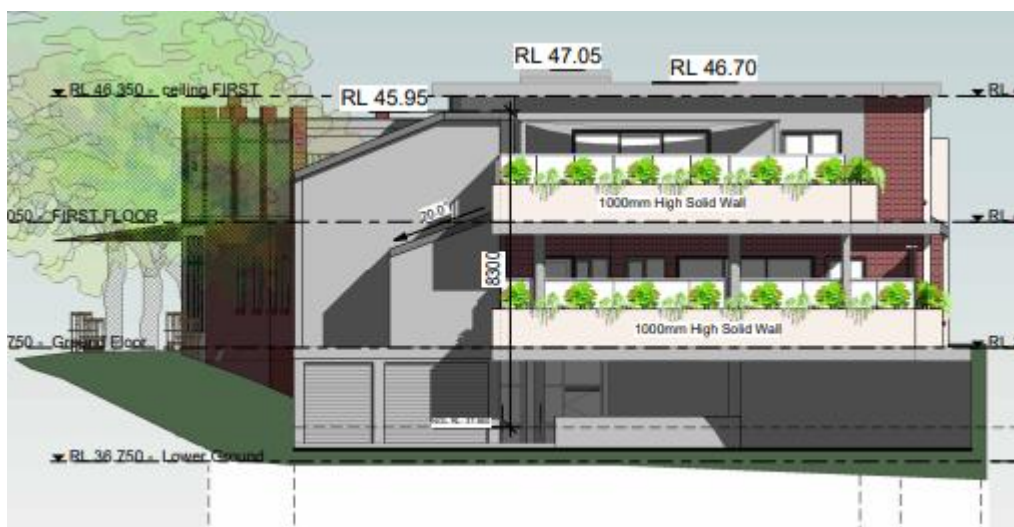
Proposed East Elevation (facing Kerr Library site)
